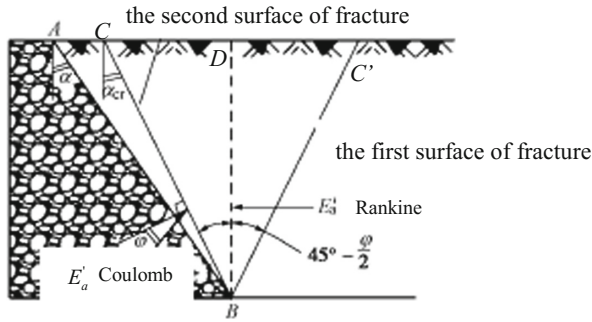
Substantially planar retaining wall and Coulomb and Rankine earth pressures.
